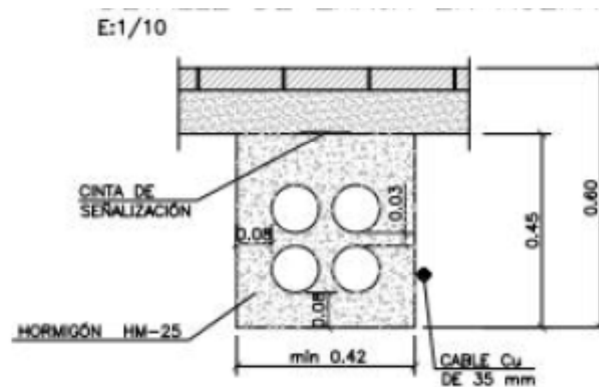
Detailed ditch on sidewalk (source: Esteyco)
